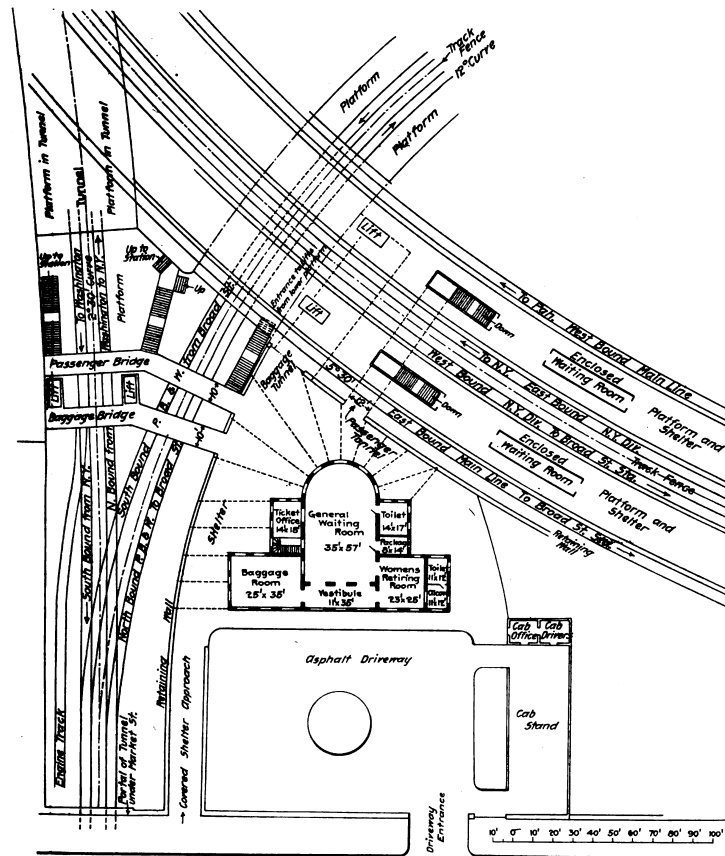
Arrangement of Tracks at Thirty-second Street Station—West Philadelphia.
